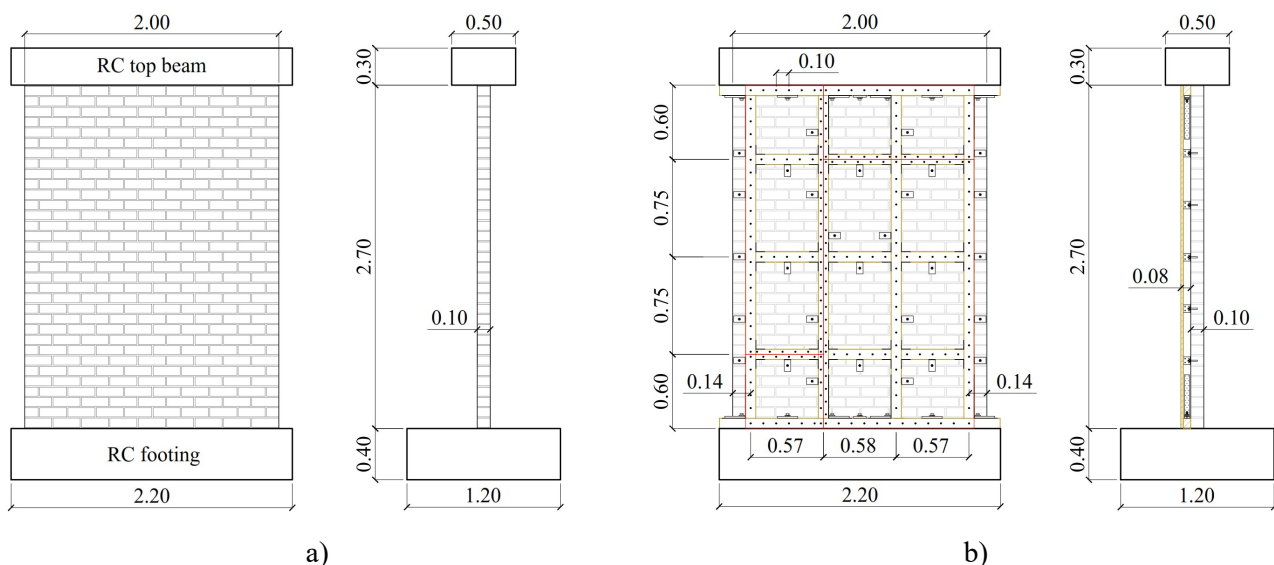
Masonry specimens: a) bare condition; b) retrofitted configuration.
